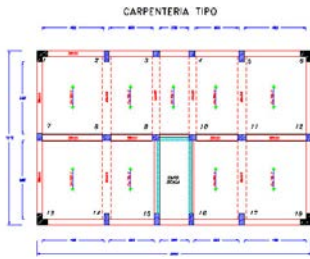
A: Seismic Strengthening Techniques : Floor Plan of a Strengthened Building
